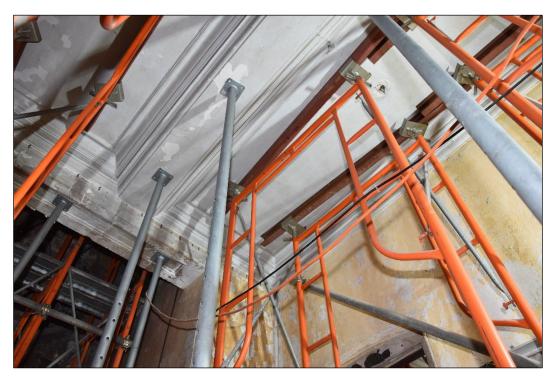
Main Building, ground floor, typical stepped ceiling cornice, (8<sup>th</sup> October, 2024)
